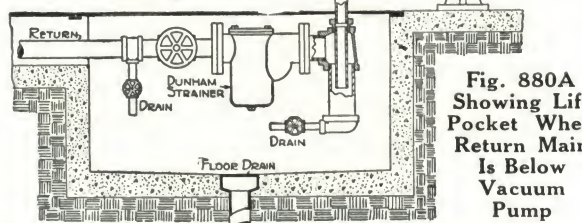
A. Showing Lift Pocket When Return Main Is Below Vacuum Pump
